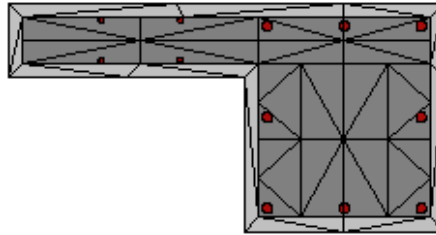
Outer beam fiber section of T- beam section 0.4x0.35 (8 No.18) for 8 story.
